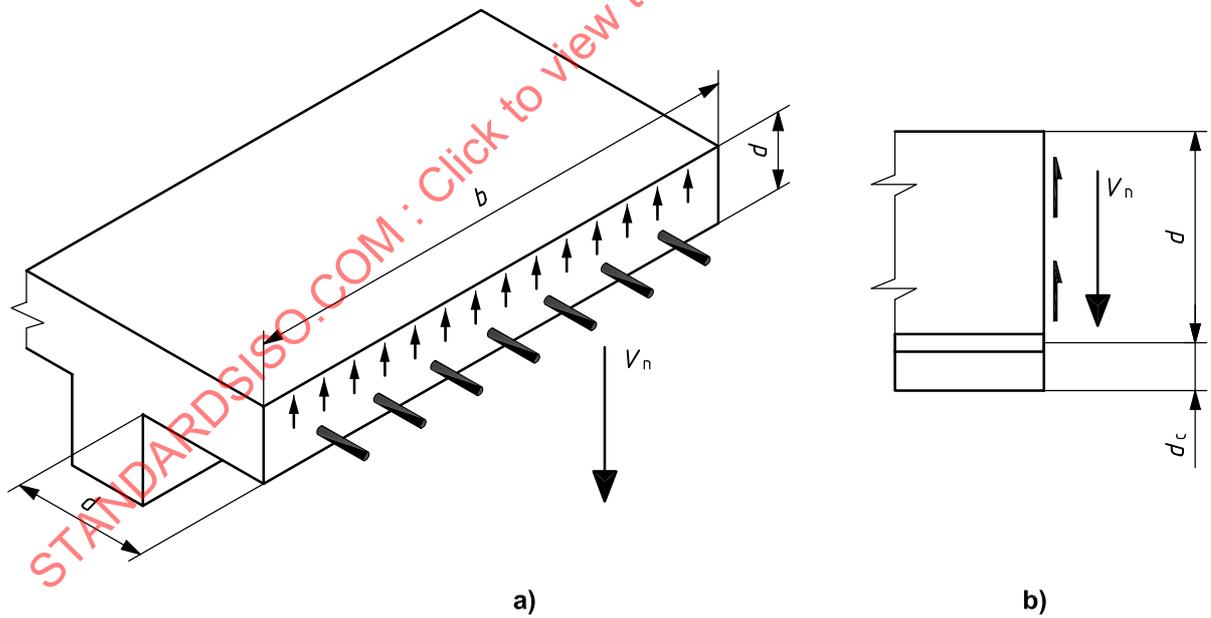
Contribution of concrete to beam-action shear strength in solid slabs
